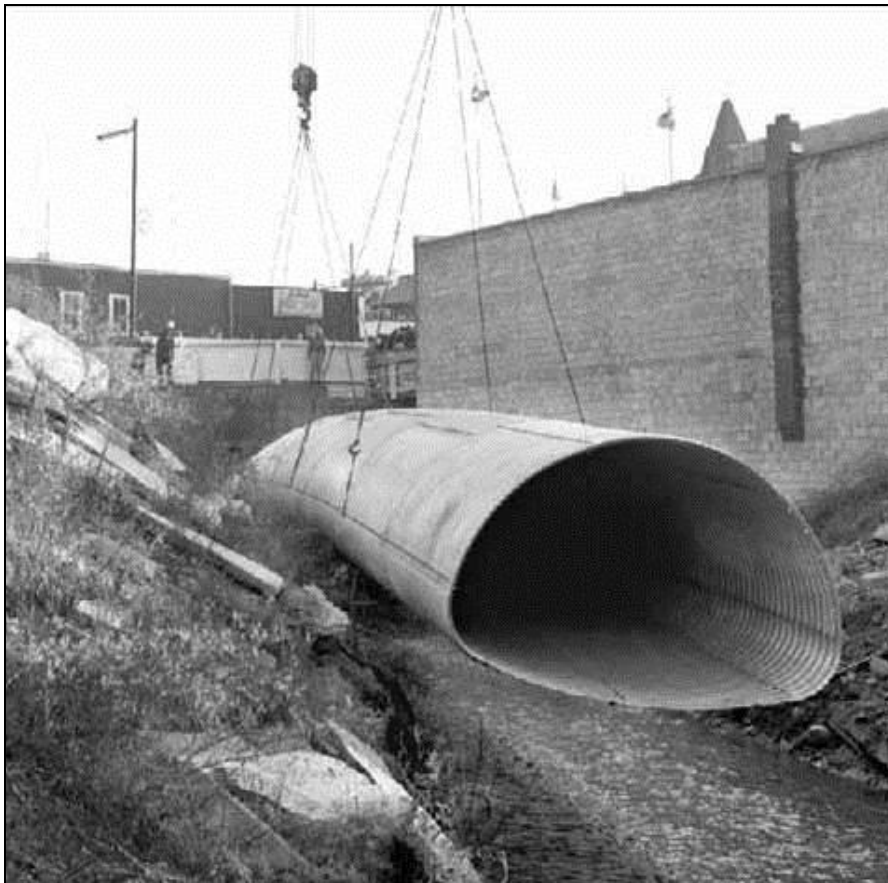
Looking south at installation of culvert immediately north of Brock Street, summer of 1967. (Hvidsten, 2010)
